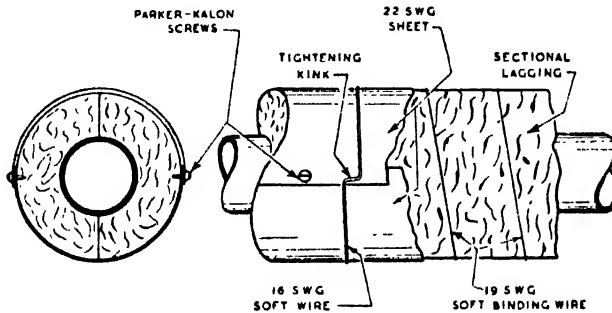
SECTIONAL MOULDED LAGGING PROTECTED BY SHEET STEEL
